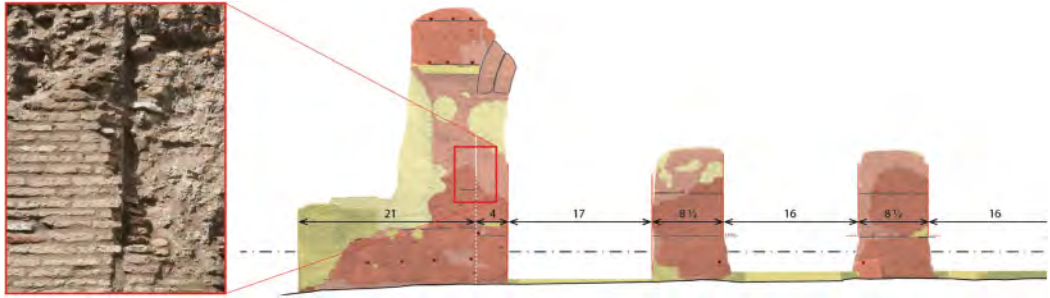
and 3b. Rome, Basilica of Maxentius. Narthex façade, southern part. View from the east. 3a: Added wall section (C). Photo: L. Albrecht. 3b: Digital rectification, white dashed line: joint run of the added wall section (C). Digital rectification: Fokus, Leipzig; TU Berlin. Graphic revision: L. Albrecht.
